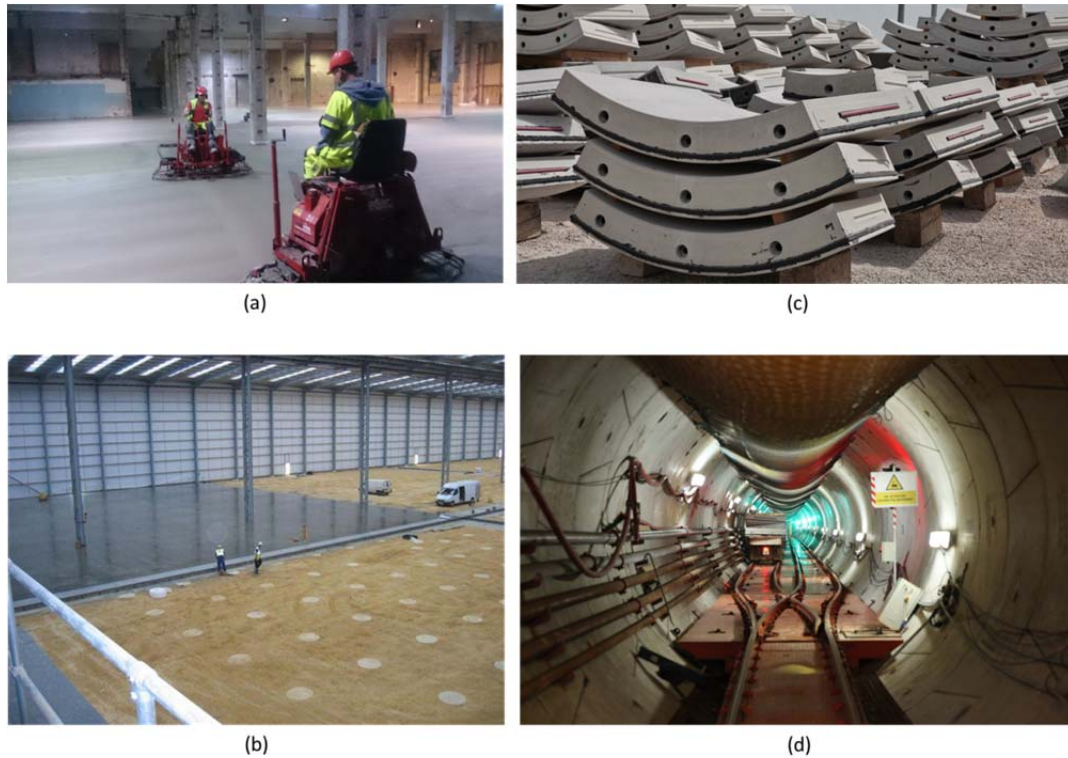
Application of SFRC: (a) joint-less industrial floor slab on grade (www.twintec.co.uk); (b) SFRC floor slab suspended on piles (www.primekss.com); (c) precast tunnel elements and (d) steel and polypropylene fiber reinforced segments
